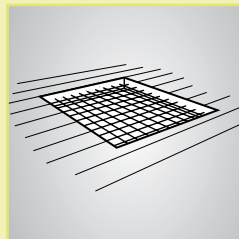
4 mm mesh embedded in the concrete floor. The hole should also be covered to prevent things falling through.
